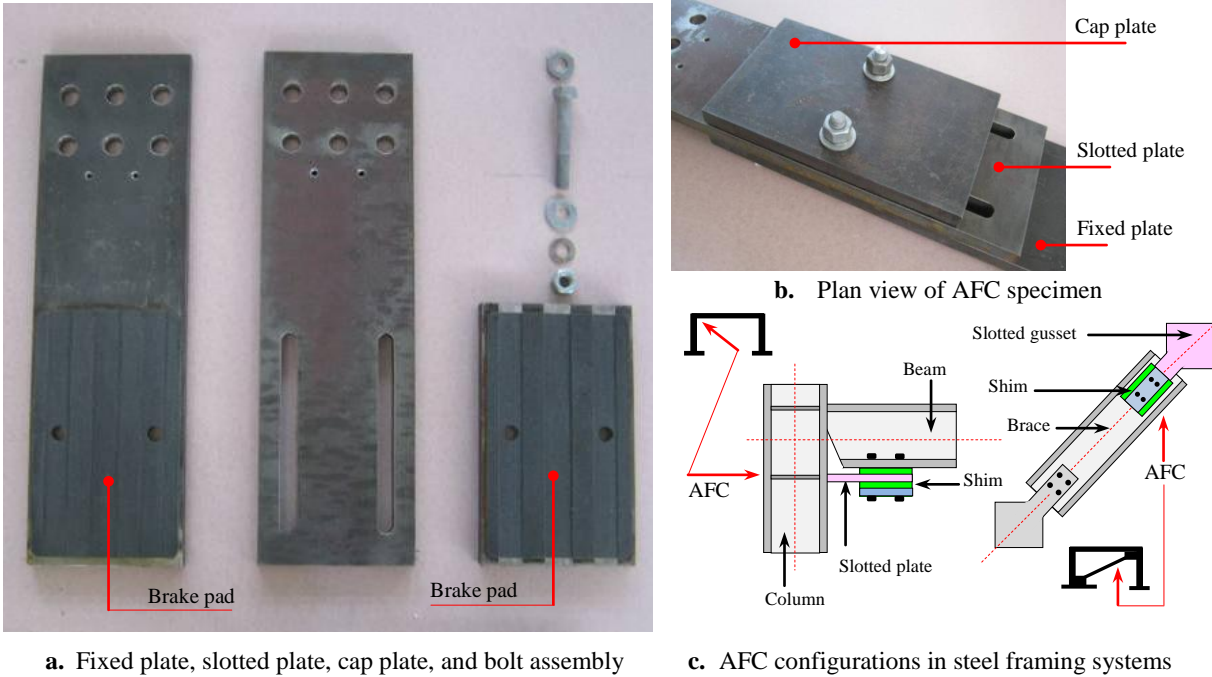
Components and Assembly of AFC specimens using D3923 brake pad material.
